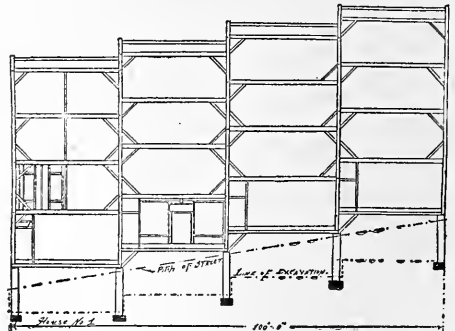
Framing Longitudinal Section of Four Houses Built On a Sloping Street.
